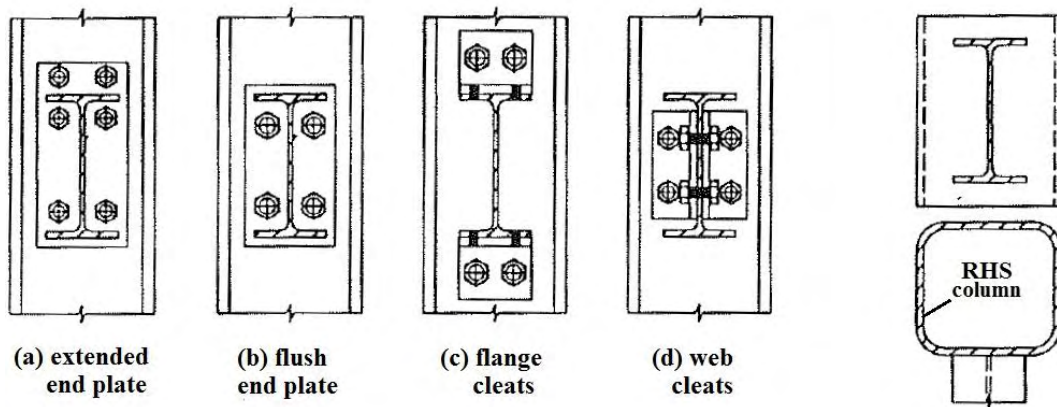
Beam to I-section column and beam to RHS section column joints ^[2]
